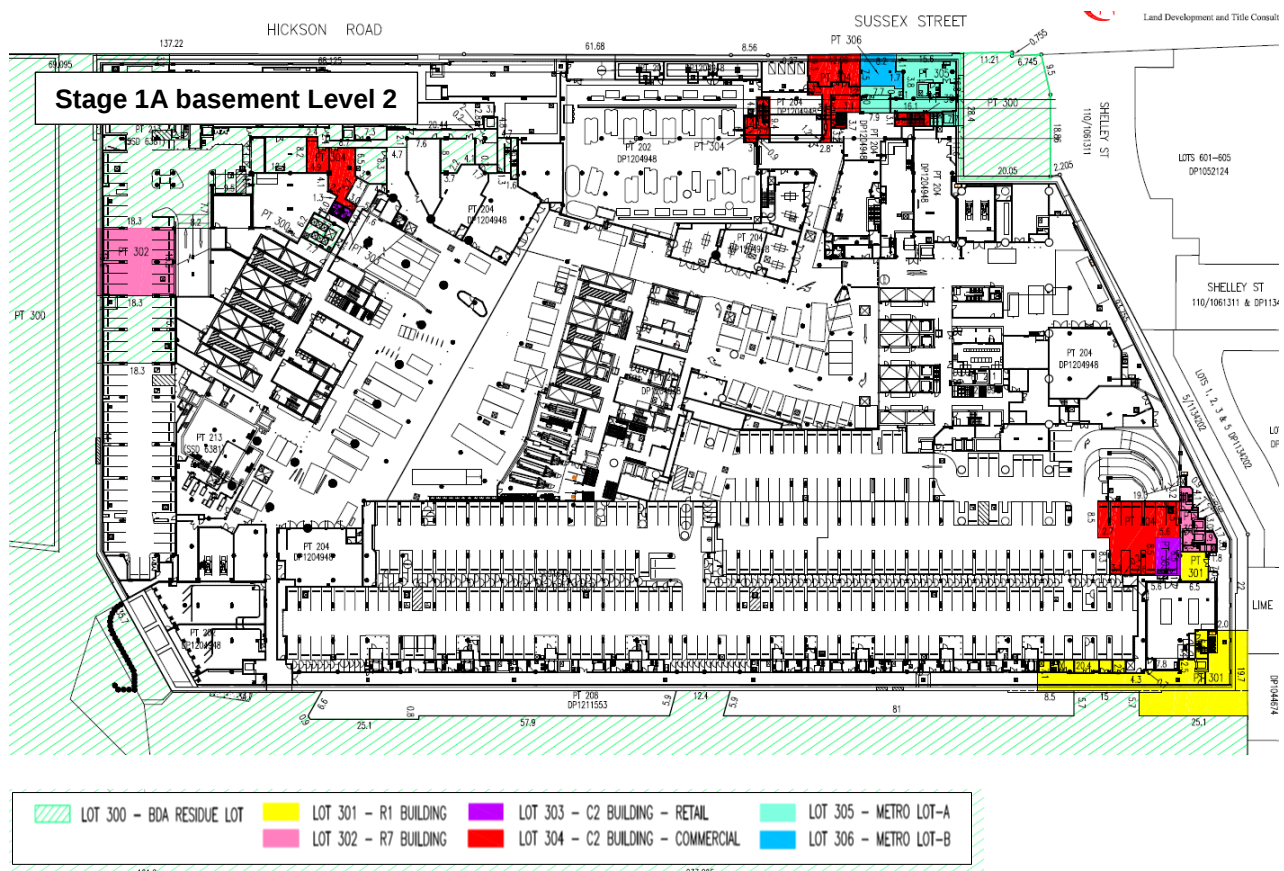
Proposed plan of subdivision for Stage 1A basement Level 2 at Barangaroo South (Source: Rts)
